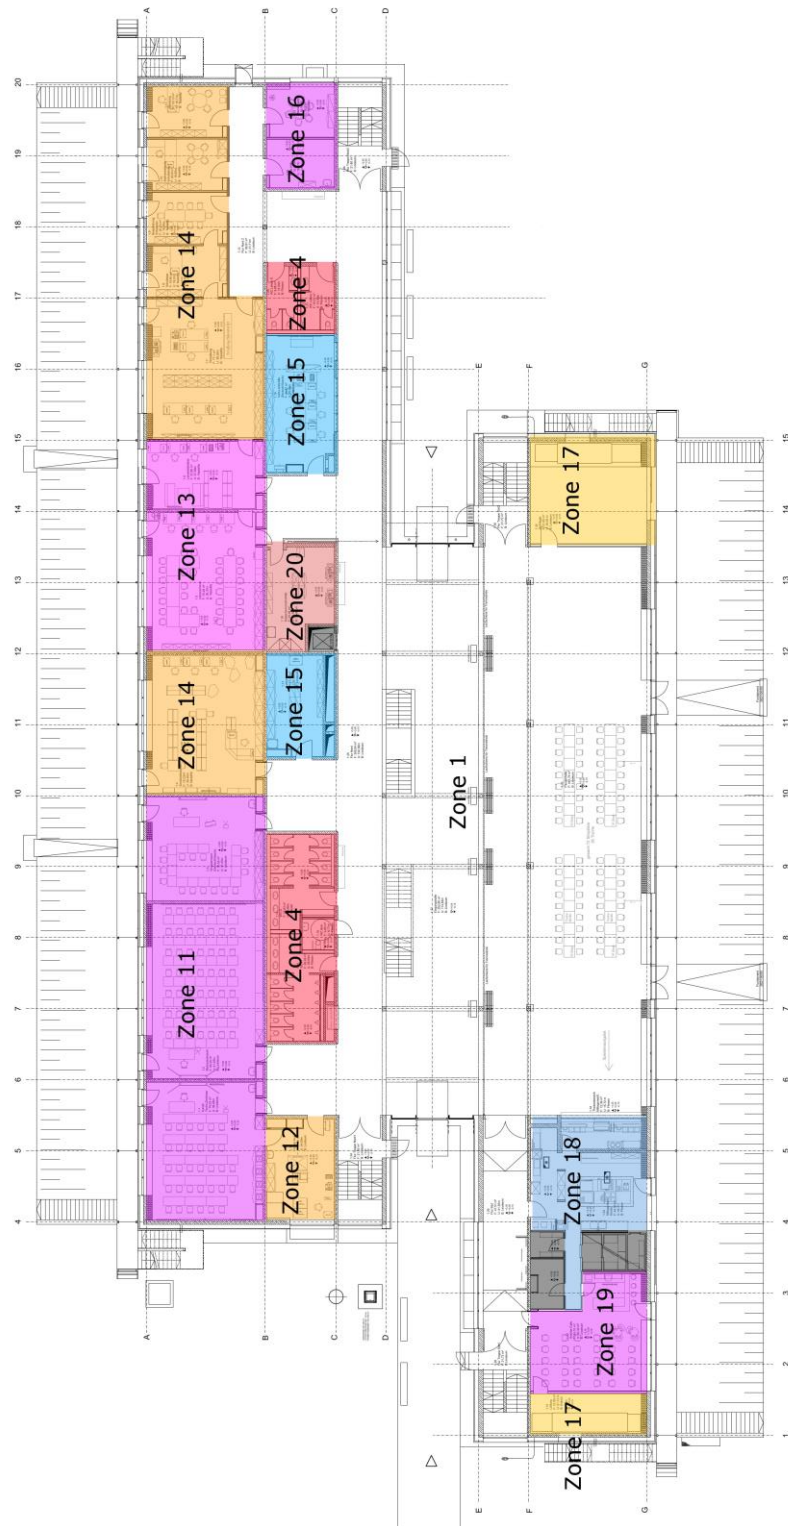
Floor plan of the building ground floor including separated zones with different colors (background plan from (kplan 2011)).
